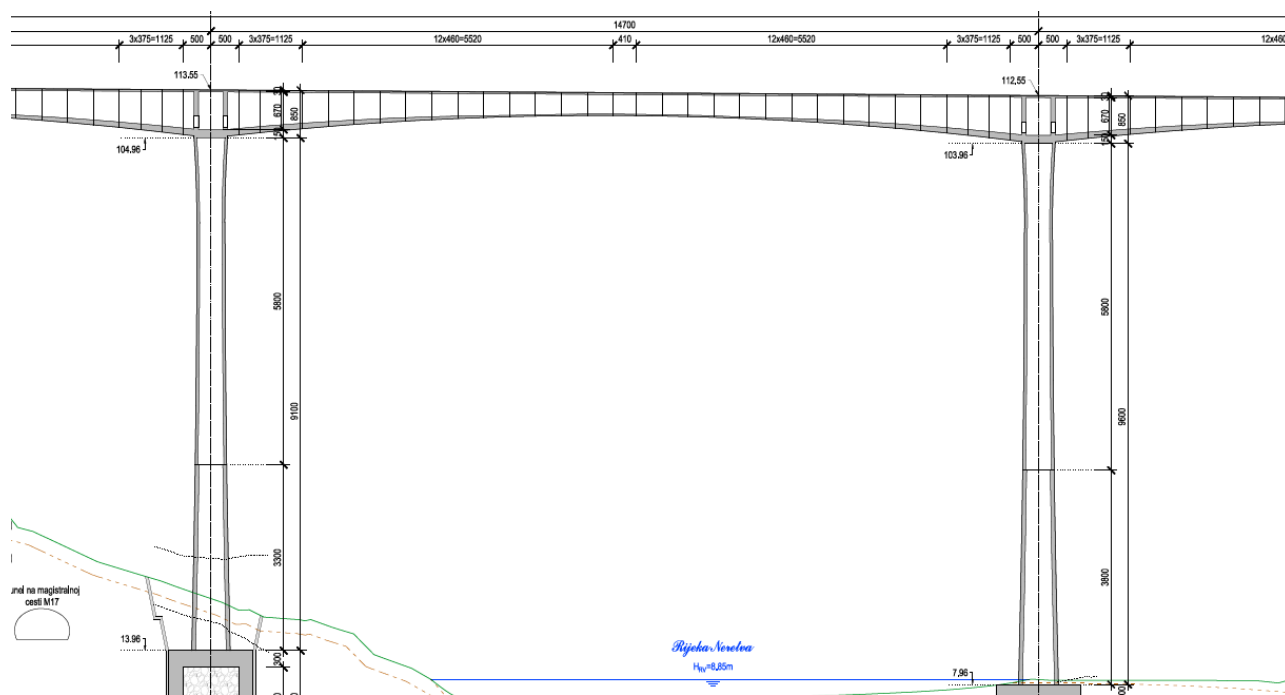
A side-view of one section while crossing the river Neretva and following shore-terrain
